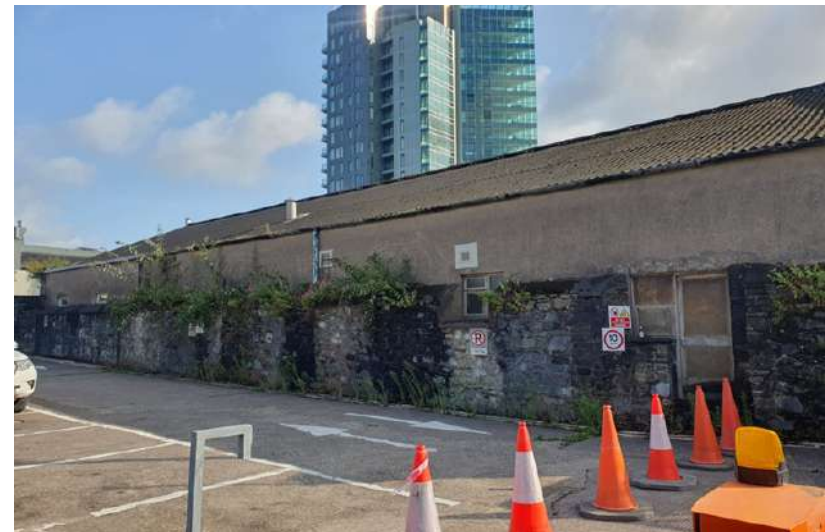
Stone wall between the shed buildings and the car park within the proposed development area, facing northeast
